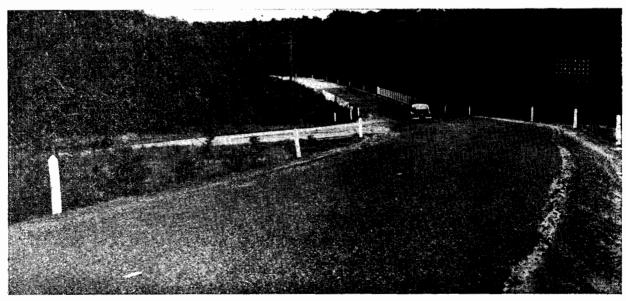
The reconstructed and widened approaches to a bridge over the Balcombe Creek on the Nepean Highway.
